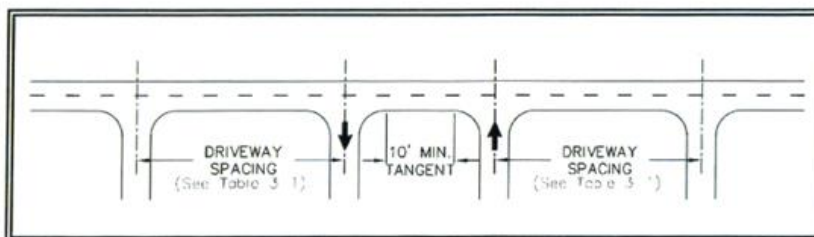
SPACING CRITERIA FOR ONE-WAY DRIVEWAYS
